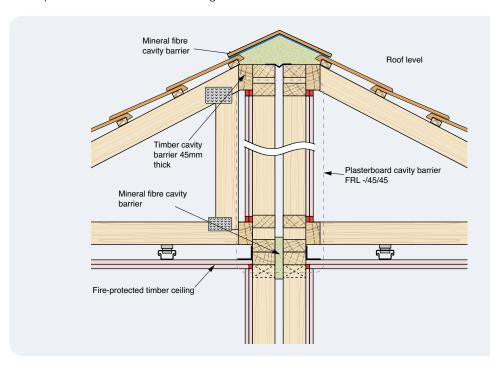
Roof space Option 2 fire-protected timber ceiling and cavity barriers within roof space.
